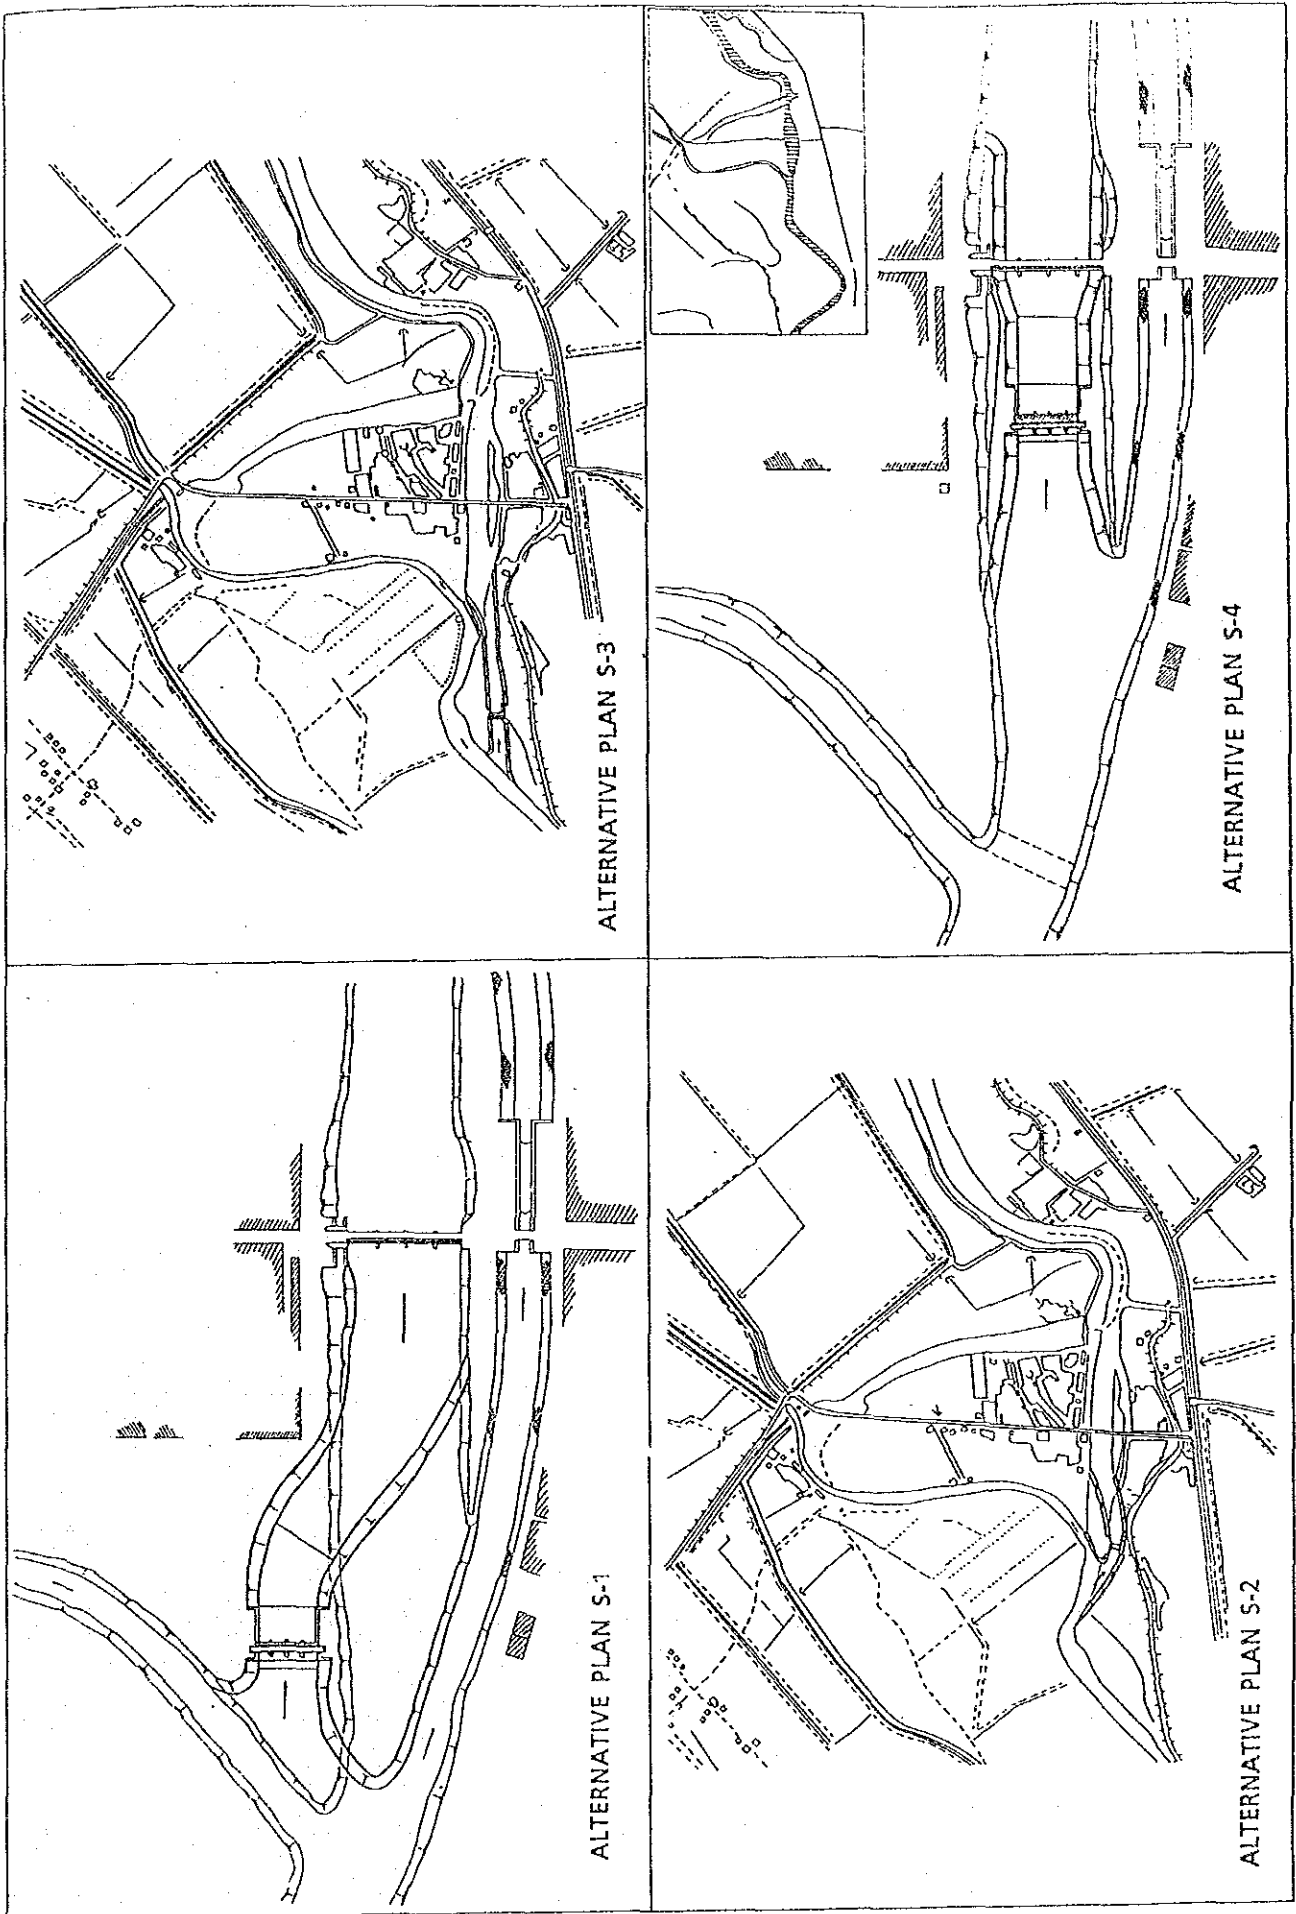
Alternative Plan of Proposed Site (Mazoura Regulator)
